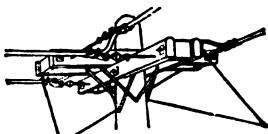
An inside corner turn with Matthews' cable clamps, using "bridle" guys.
